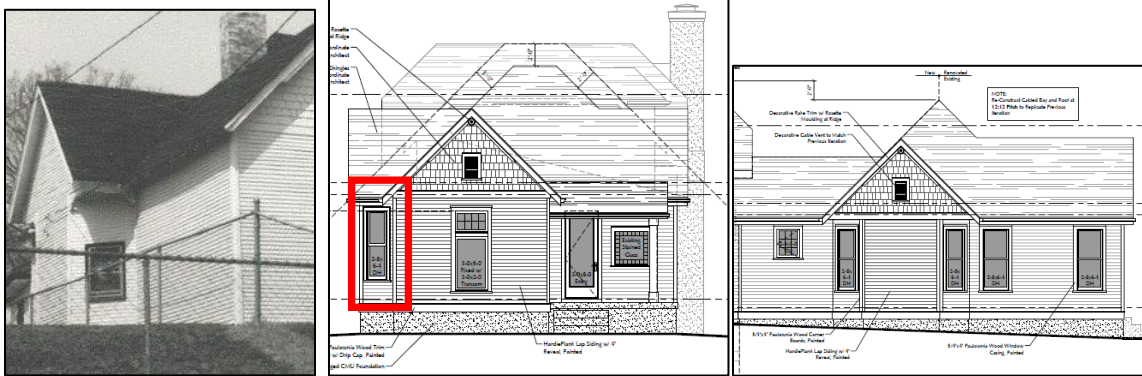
(left) is the c. 1986 photo showing the windows on the left façade. Figure 14 (middle) shows the elongated window on the front part of the bay, and Figure 15 (right) is the left façade elevation showing the addition of the windows at the front of the left elevation, the elongated bay windows, and the new window opening at the back.
